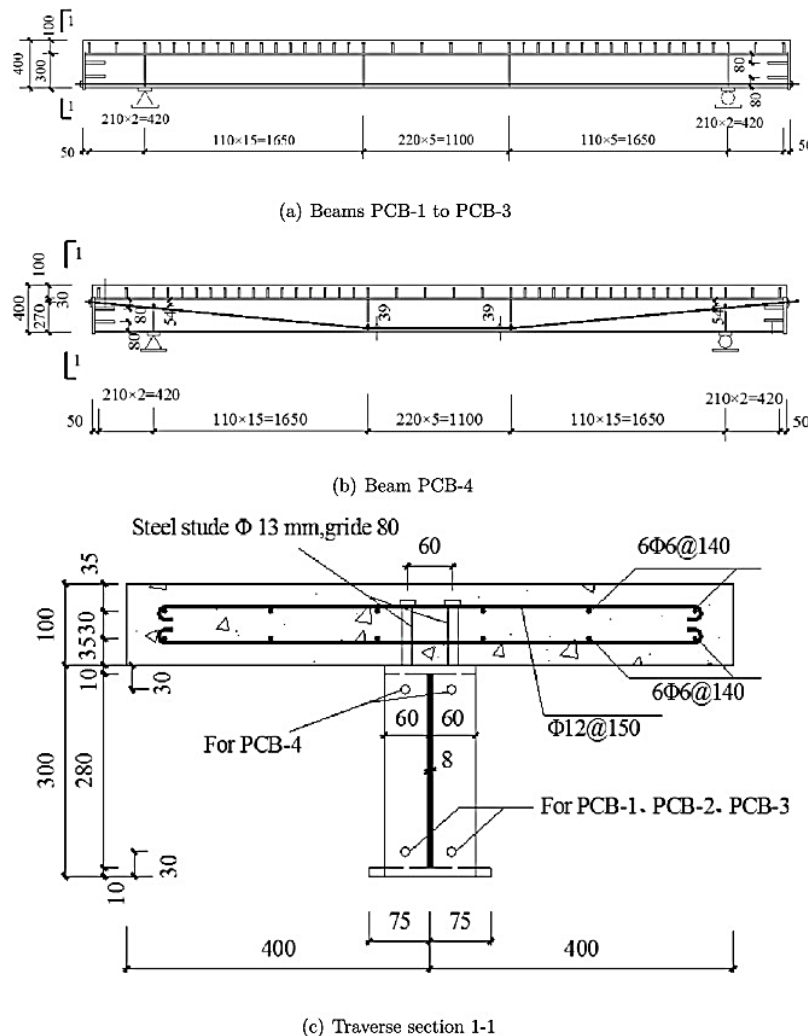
Geometric details of PCBs (Zhou et al., 2018)
